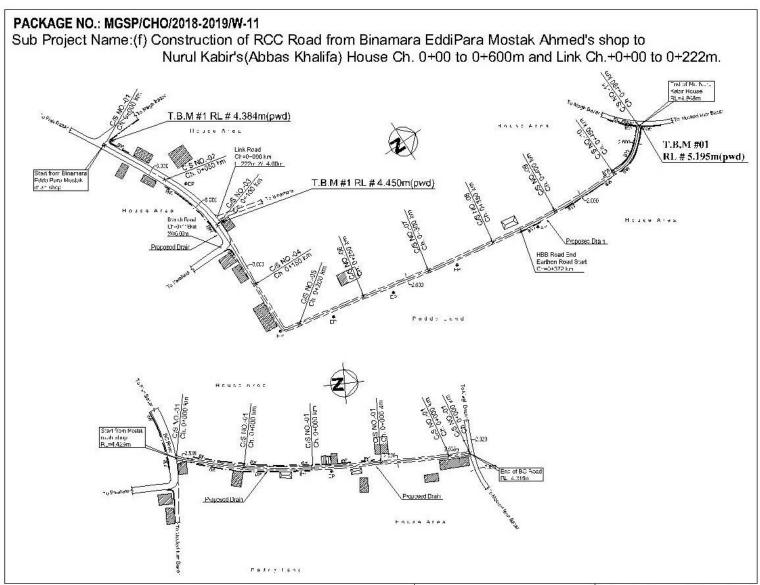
(f): Layout Plan of the proposed Subproject Road from Binamara Eddipara Mostak Ahmed's shop to Nurul Kabir's (Abbas Khalifa) house with Link road
